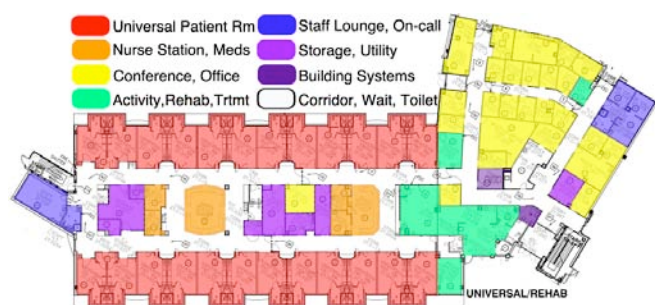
Floor plan: General layout configuration of lower level wing with Universal Care Suite (UCS) on left and core area on right.
